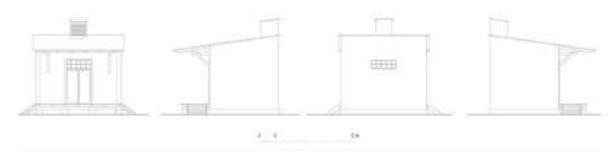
Elevation of digitally reconstructed model of Warehouse no. 10. Source: author.
